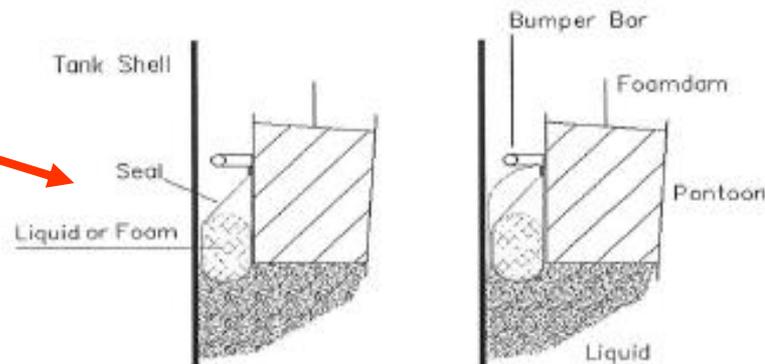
Typical Liquid-Mounted Foam Seals
